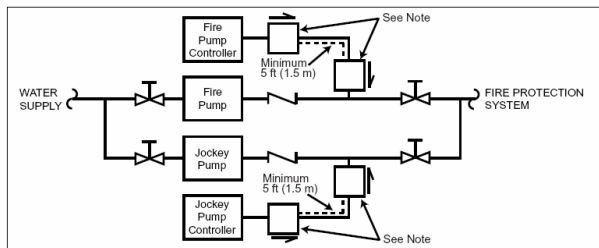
(a) Piping connection for each automatic pressure switch (for fire pump and jockey pumps).
